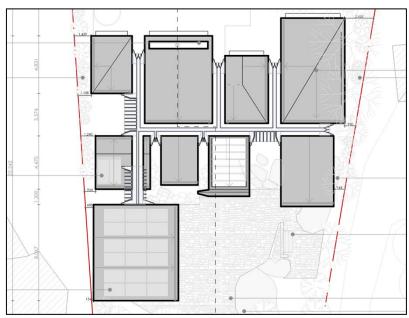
Partial site plan showing setbacks to side boundaries (Source: Fitzpatrick + partners)
